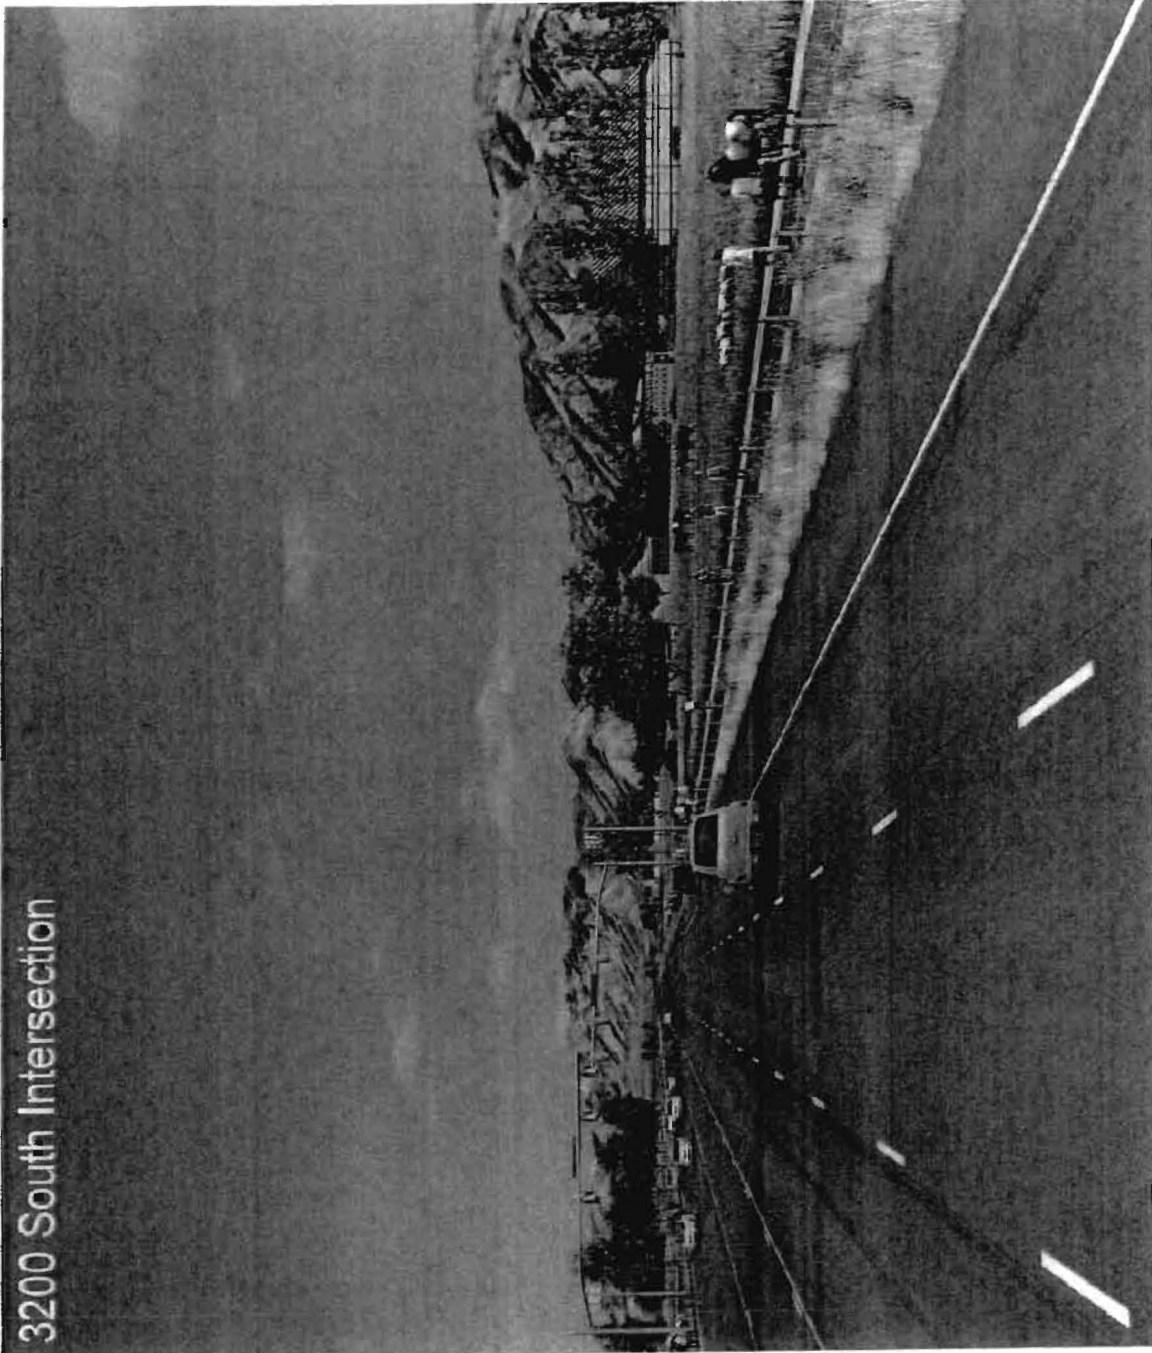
Motorist's View of 3200 South Intersection, Looking North
